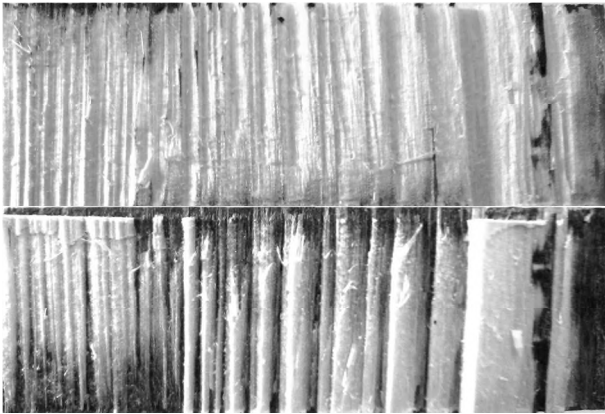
Fracture surface with wood failure of a tested drill core
